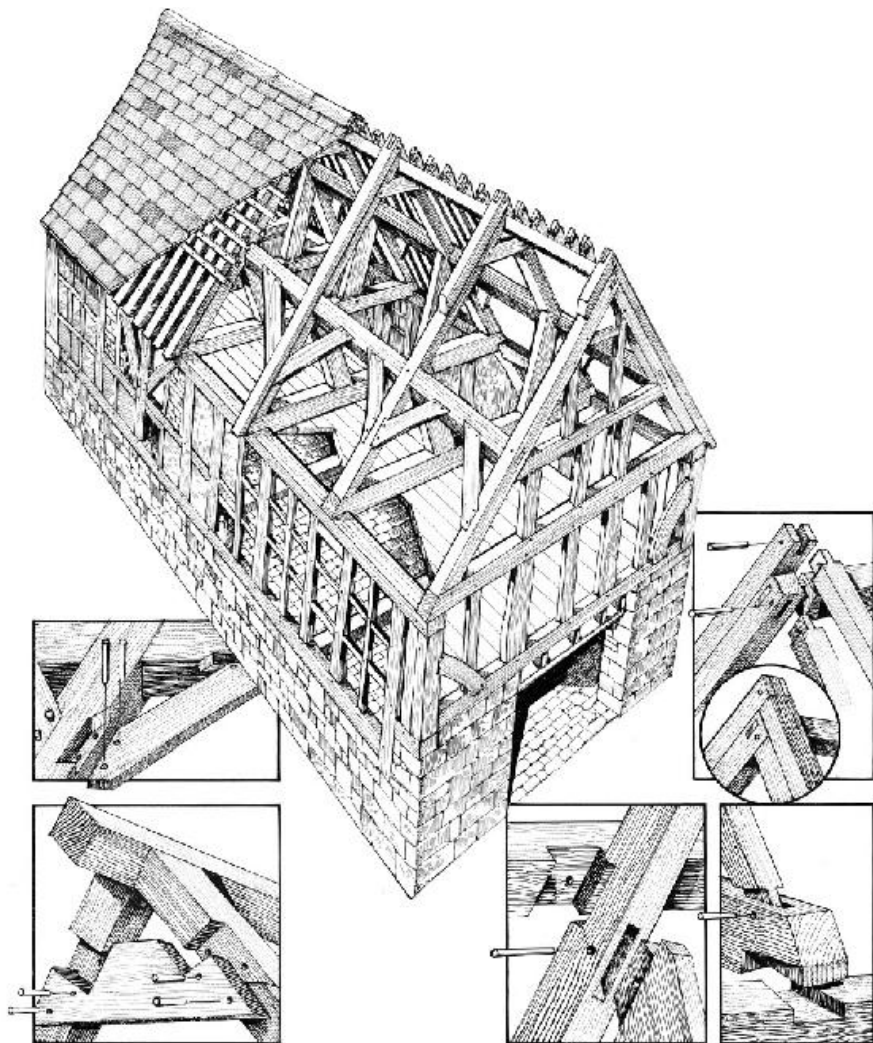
Axonometric reconstruction by Bryan Byron of the Cathedral Barn and its jointing details as it was probably reconstructed in the 17th century; the broad opening in the east gable end is conjectural
